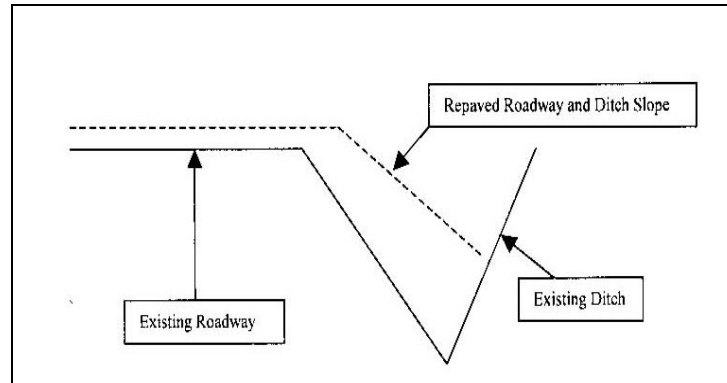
TYPICAL ROAD SHOULDER ALONG HURRICANE RIDGE ROAD BELOW THE ENTRANCE STATION
